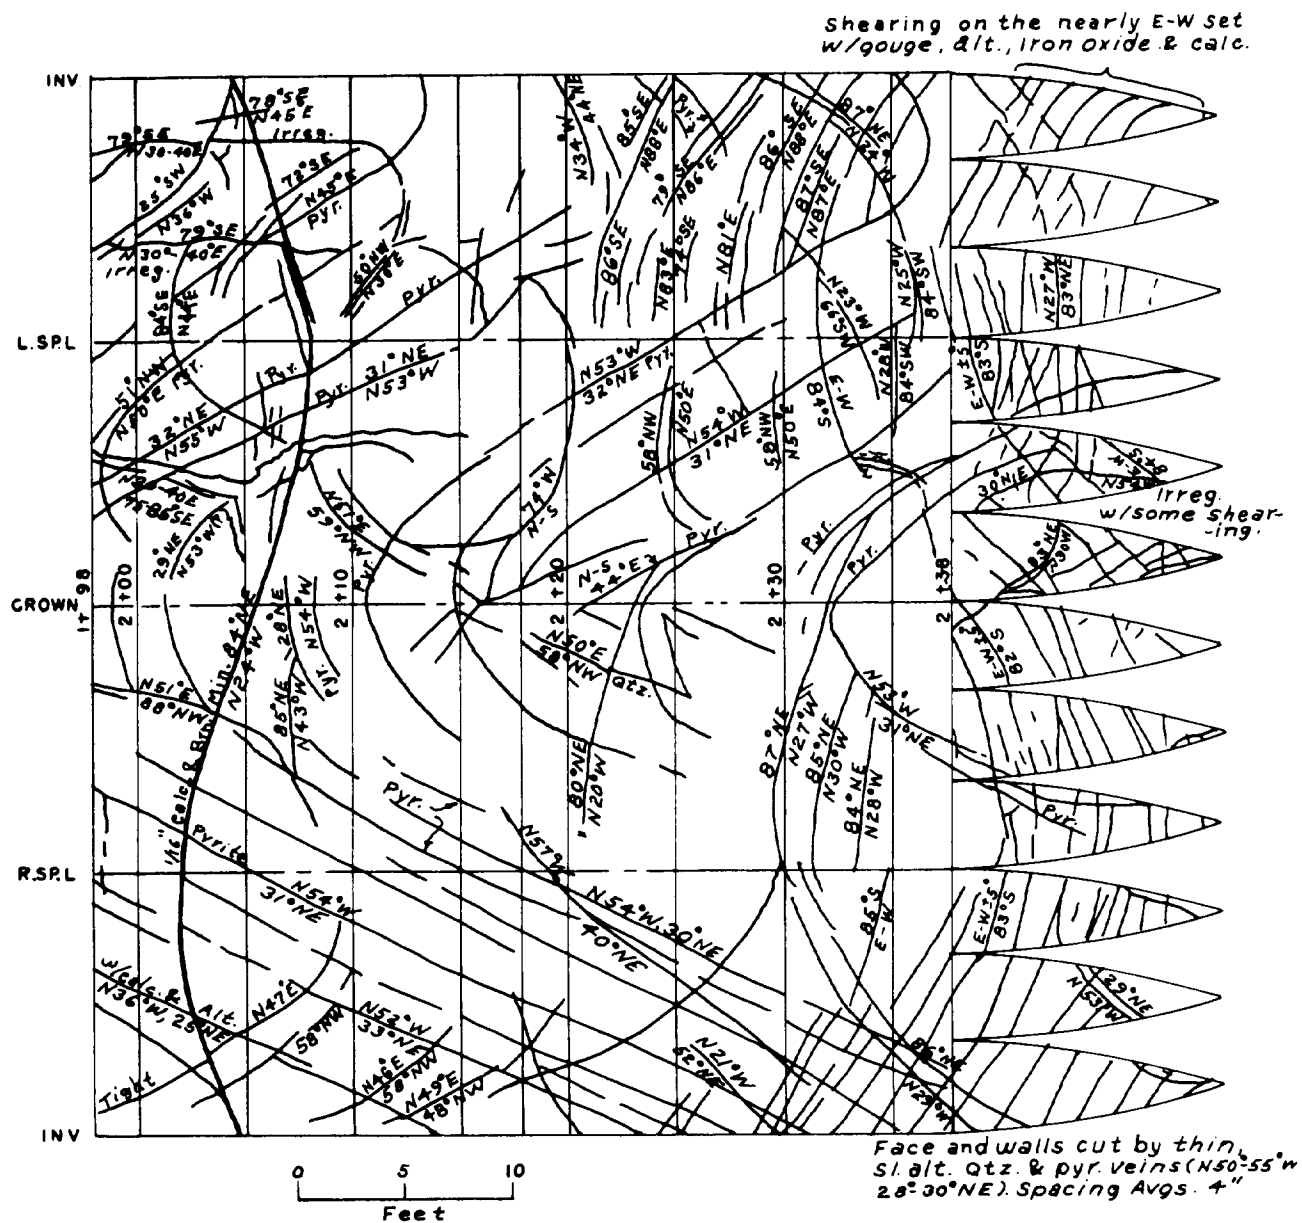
Developed plan of a cylindrical drift with a hemispherical end section
